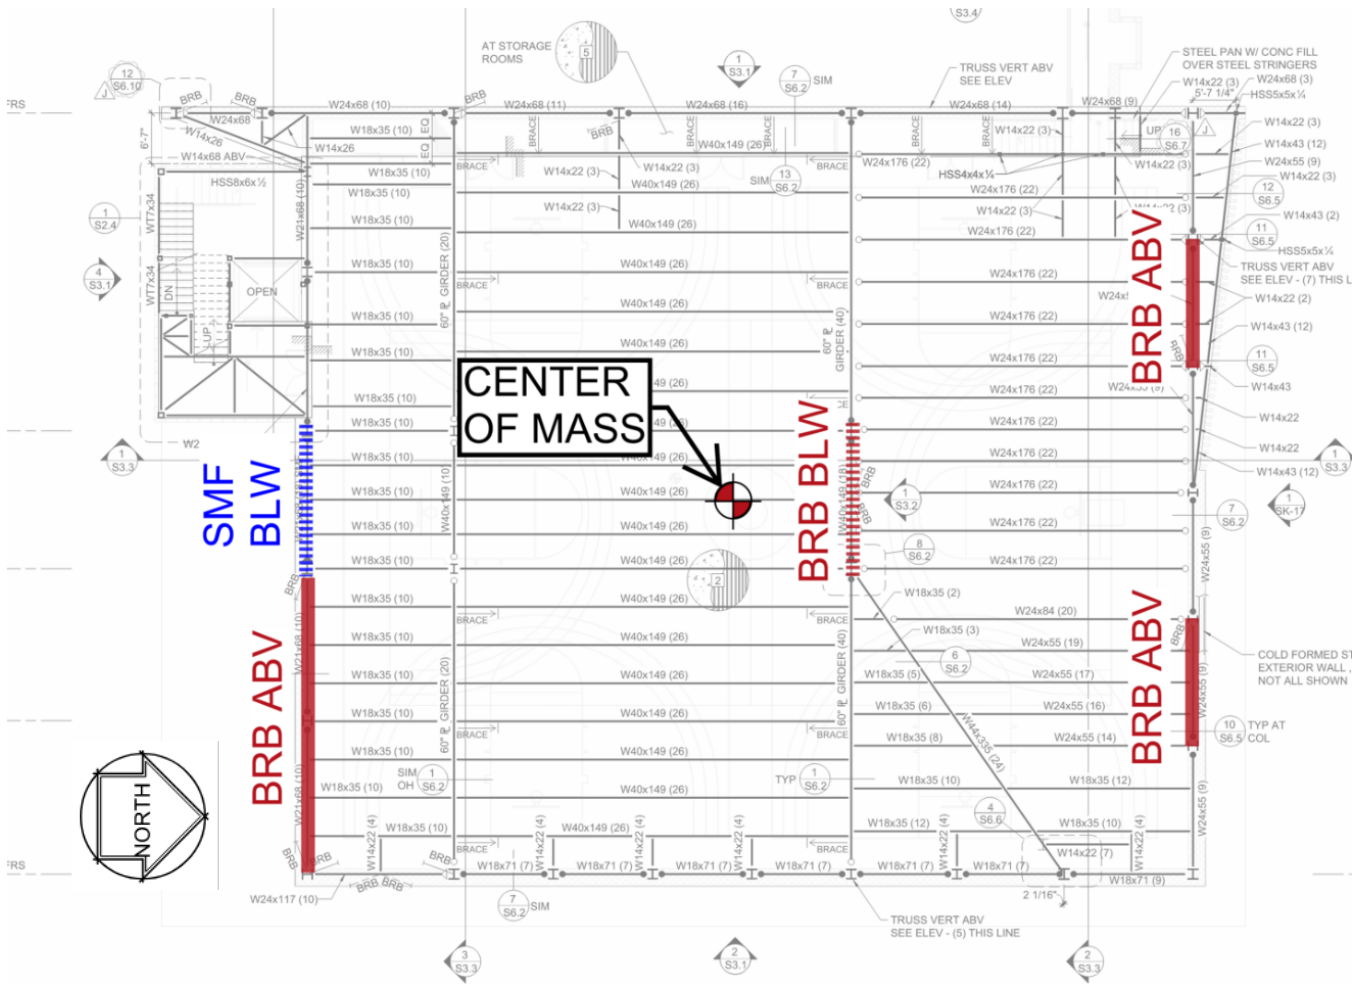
Floor Plan Showing LFRS in the E-W Direction
